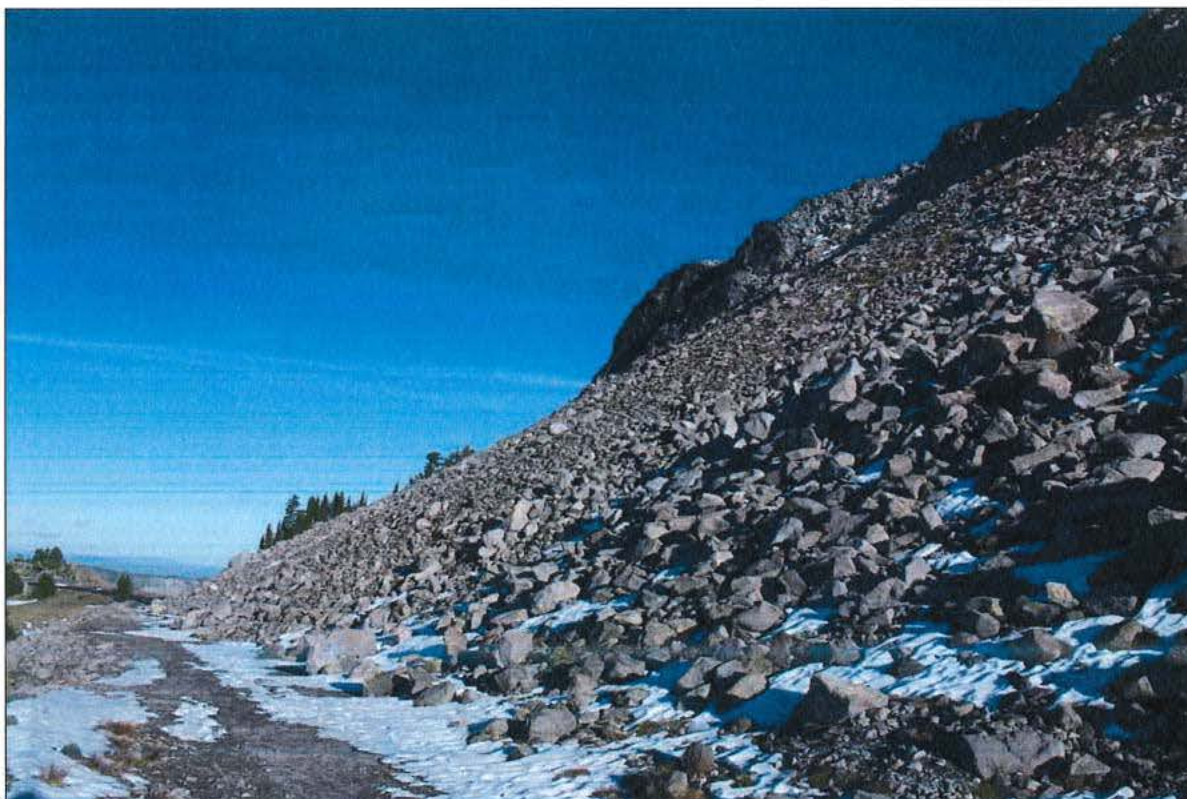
of 20: Portion of Rim Road used as the Watchman Trail, looking north
